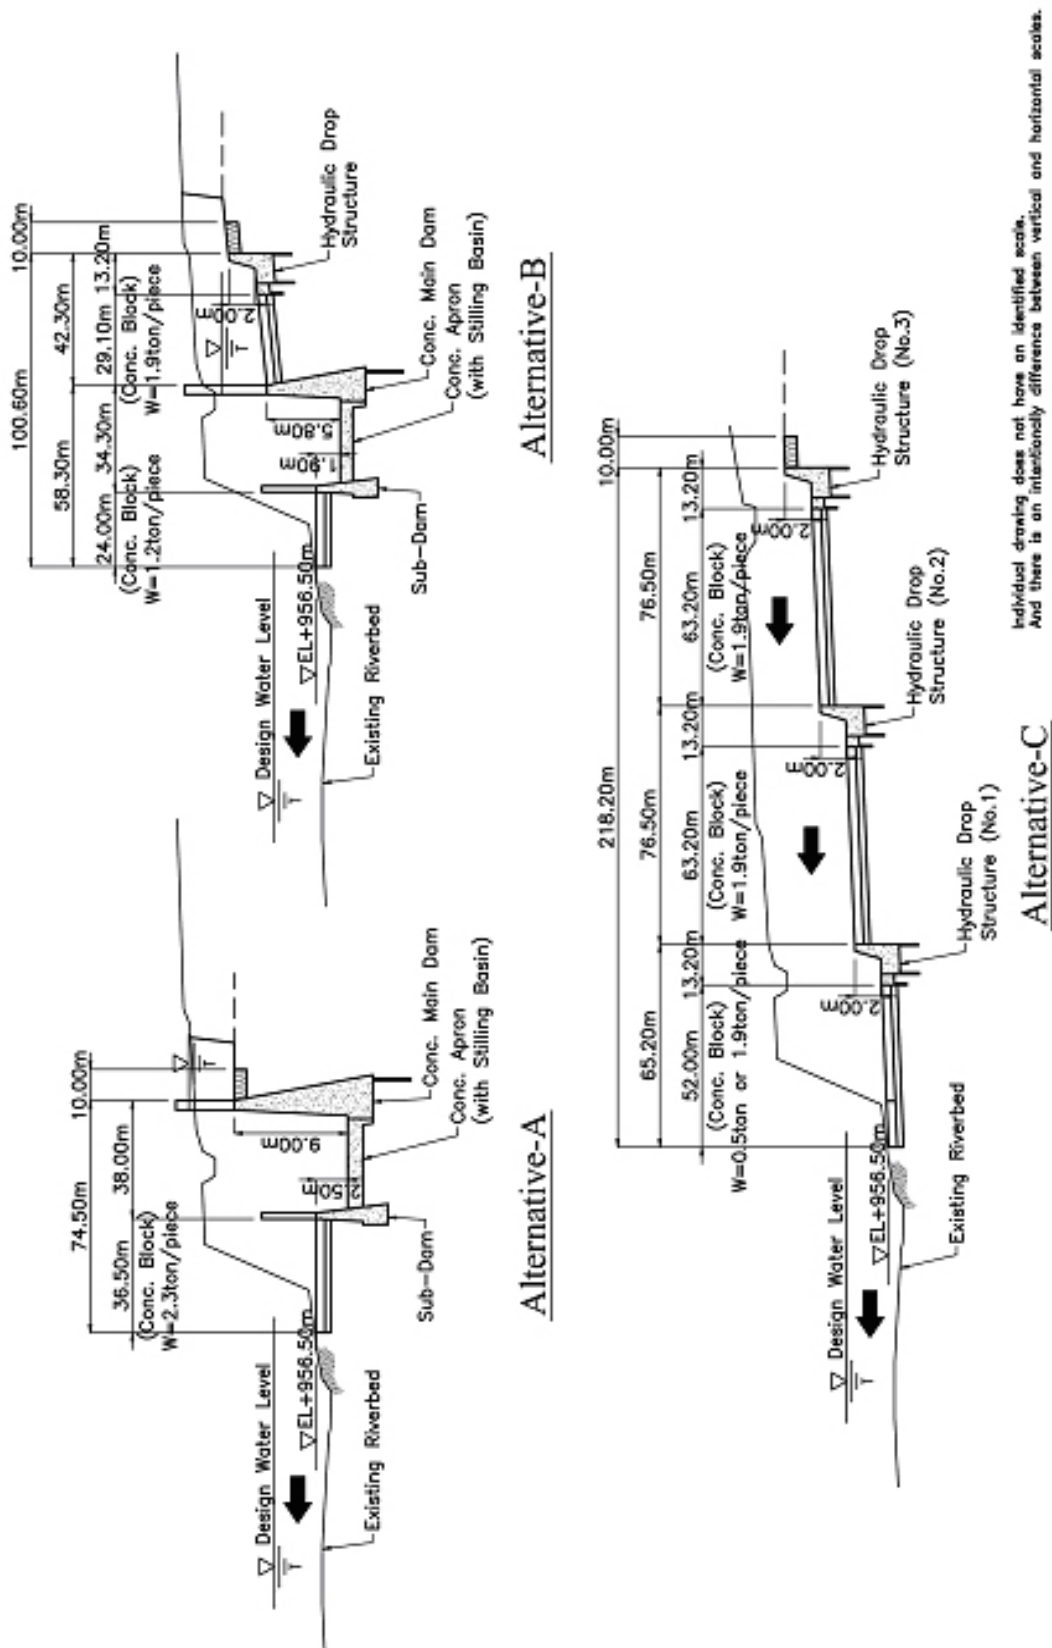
Schematic Drawings of Structural Alternatives for Riverbank Stabilization Works
